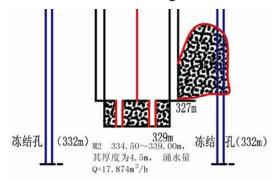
Layout diagram of the grouting pad and lodgement at the bottom hole
